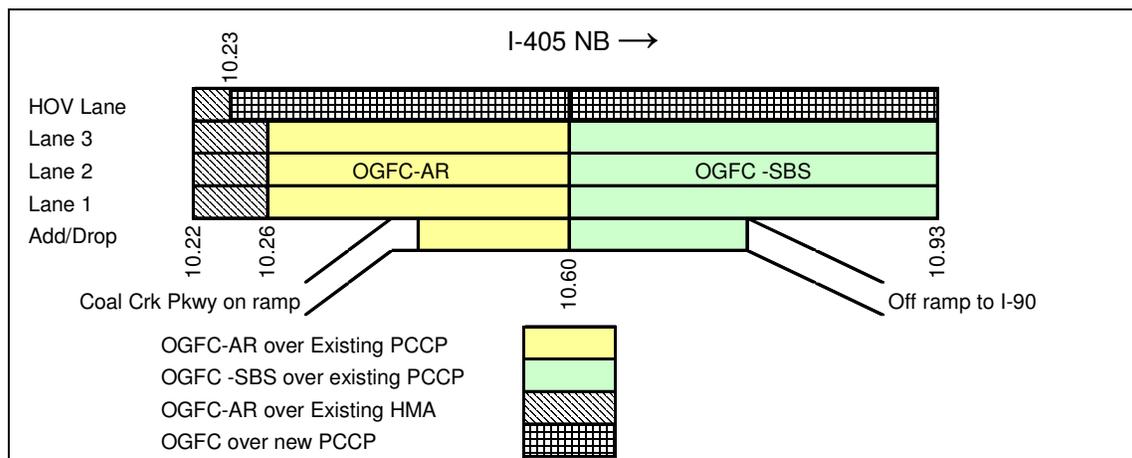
Schematic of paving limits for test sections south of I-90 (south section).
